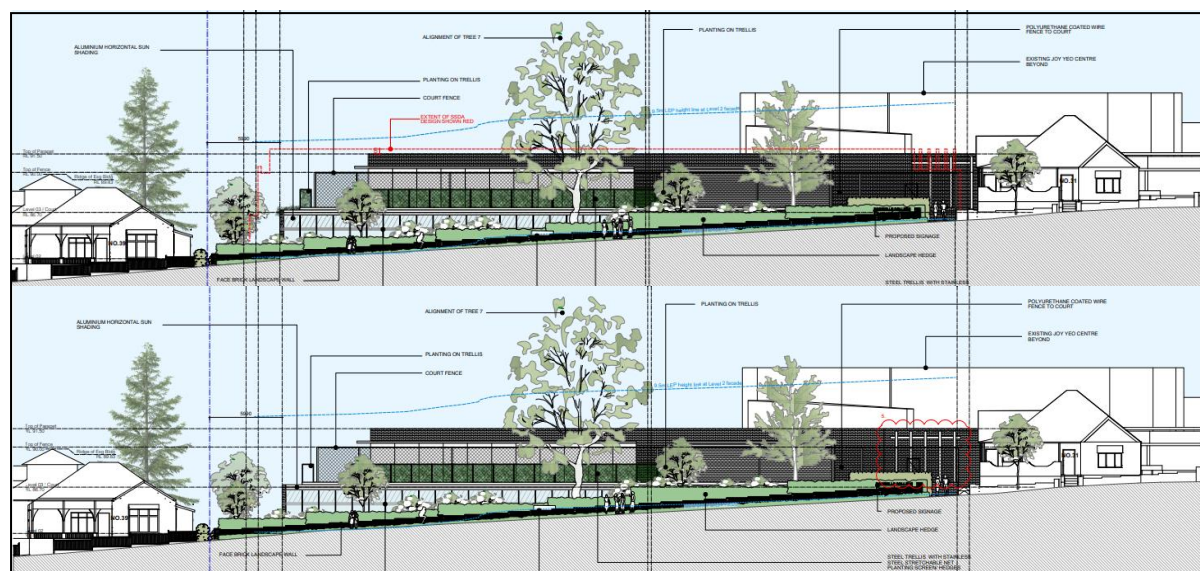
| Approved (above) and proposed (below) north elevation (Source: SSD-9912 and Applicant's Modification Report 2022)
